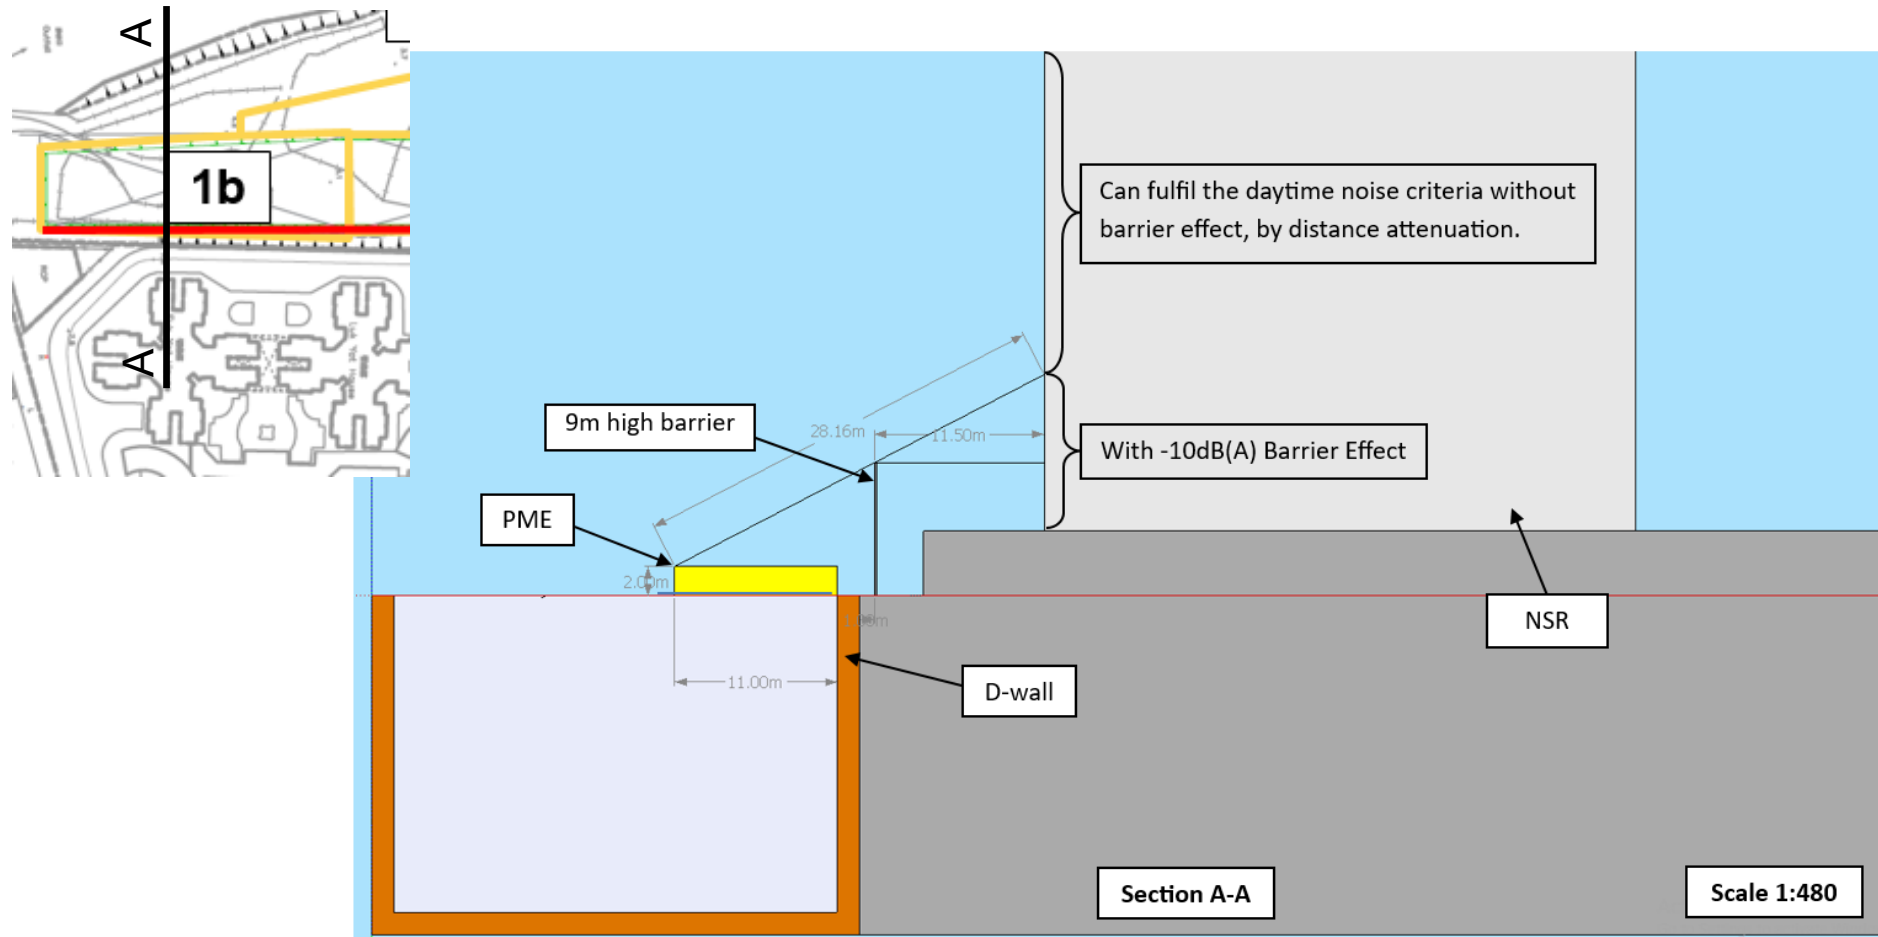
Sectional Drawing of Noise Barrier for D-wall Construction
